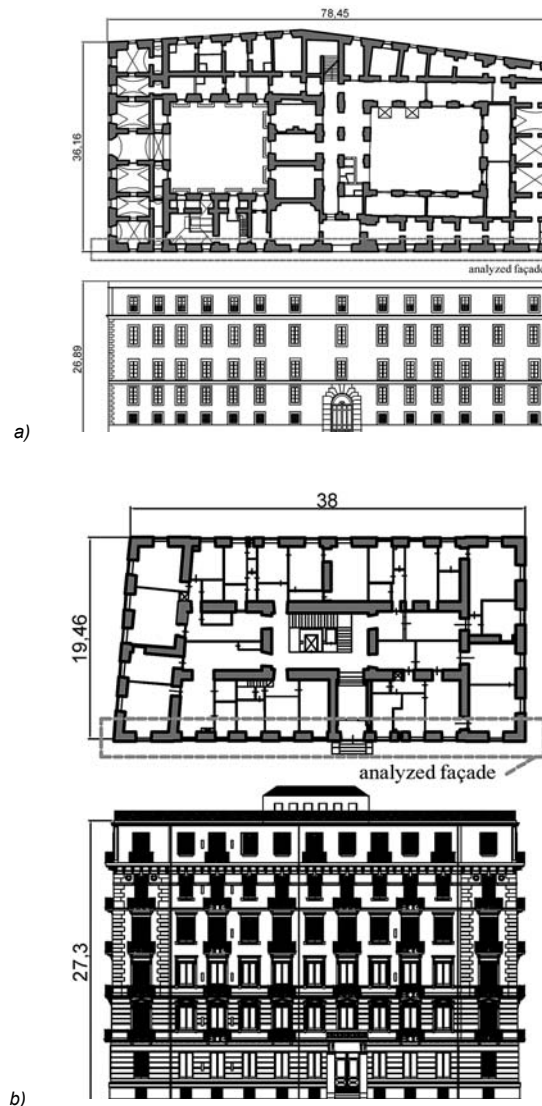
a) Building A – ground floor plan and principal façade, b) Building B – ground floor plan and principal façade
